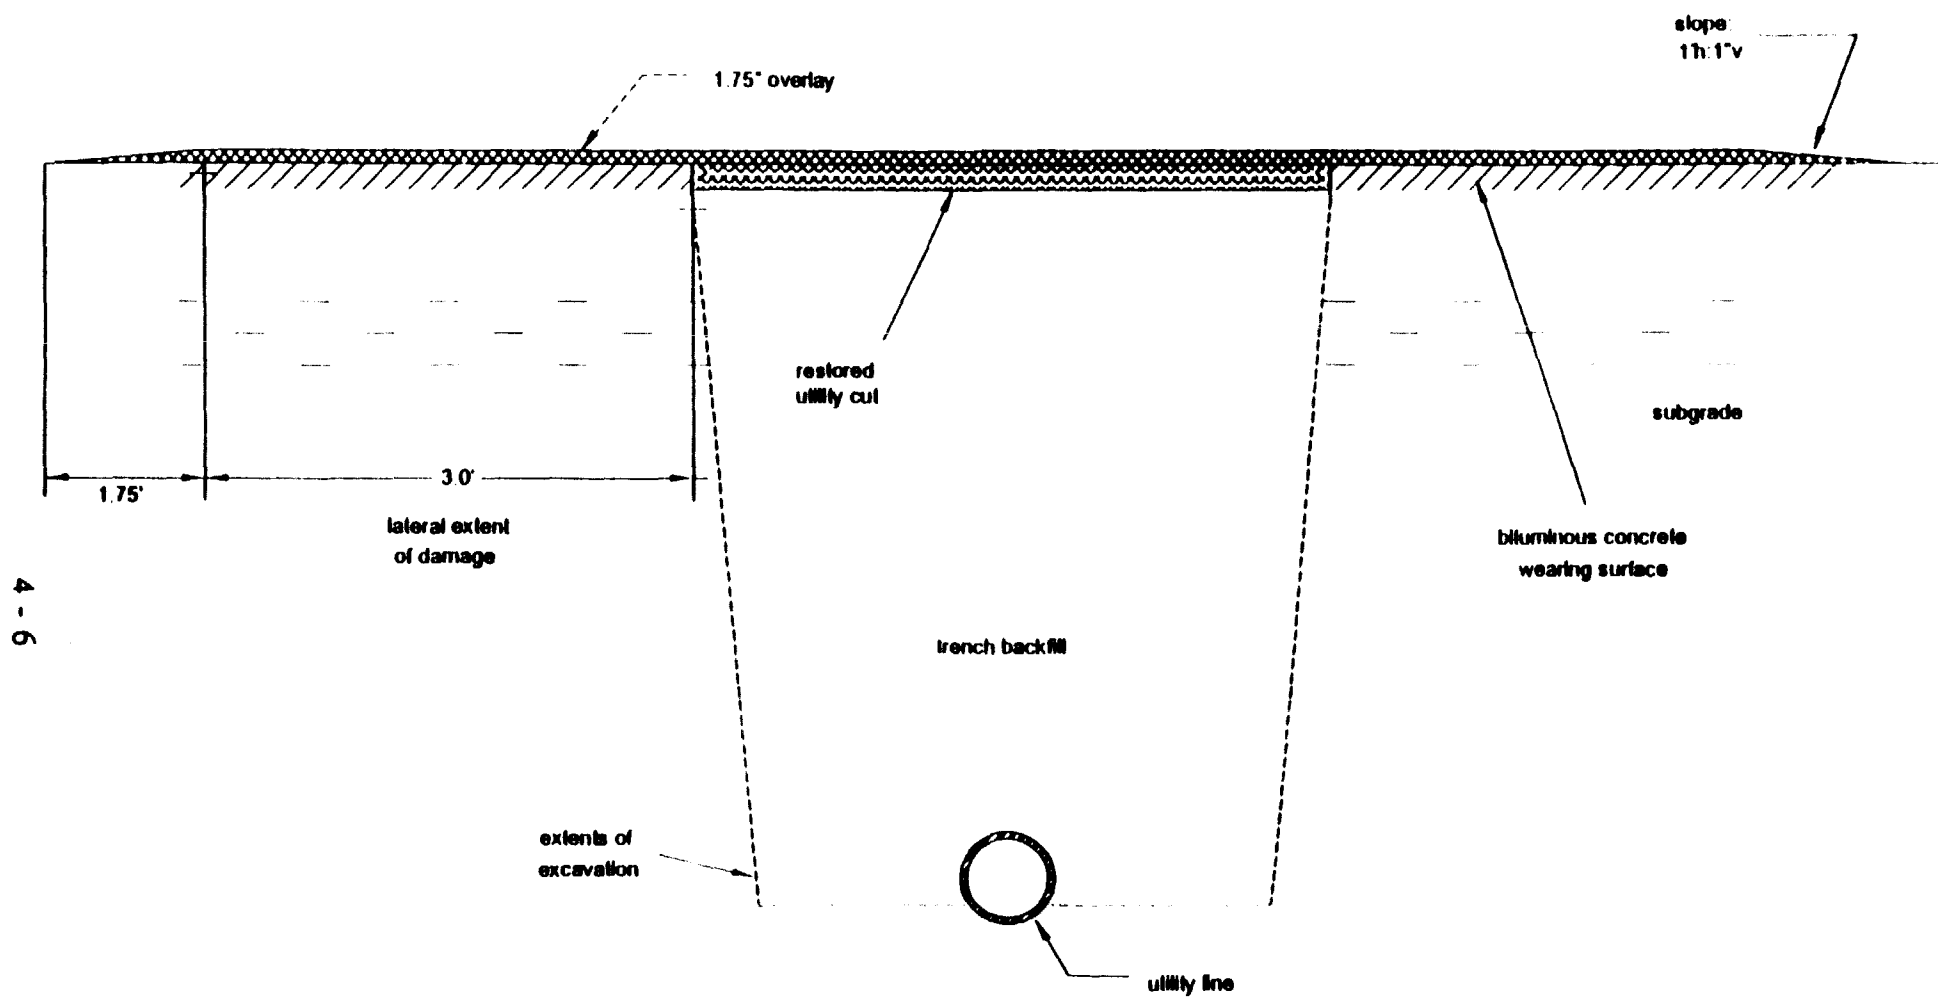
Pavement Strengthened by 1.75 in. AC Overlay - Scheme 1
